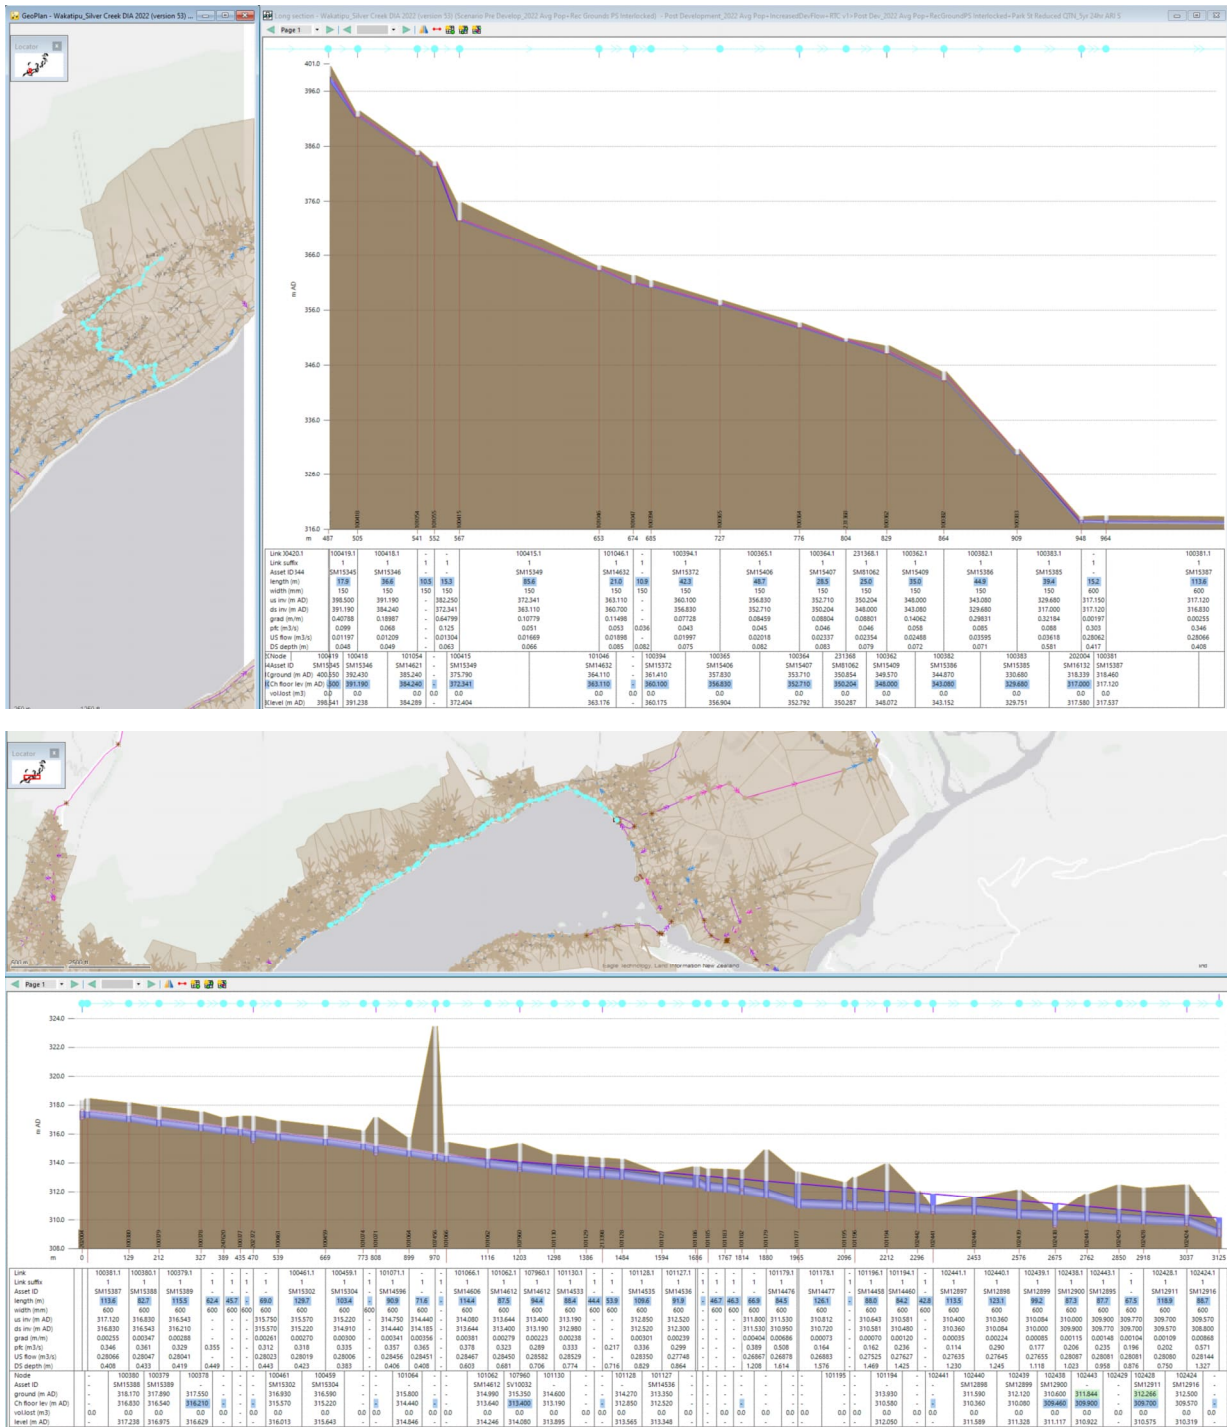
Existing (2022) Post-Development Scenario LONG-SECTION With Park Street PS existing capacity of 30l/s and without Storage at Park Street PS – 5 year ARI design storm
